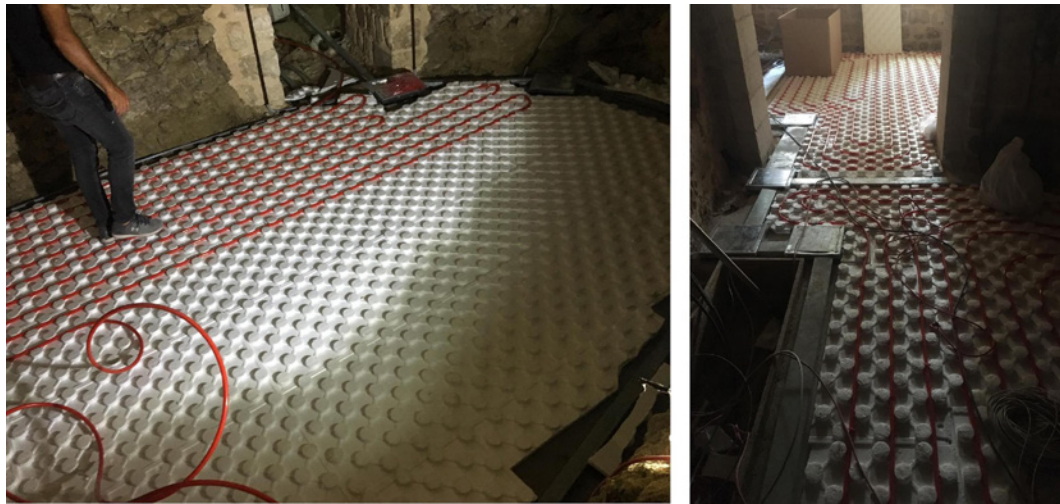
The installment of underfloor heating. Source: KMKD Archive, taken by Murat Demirli
